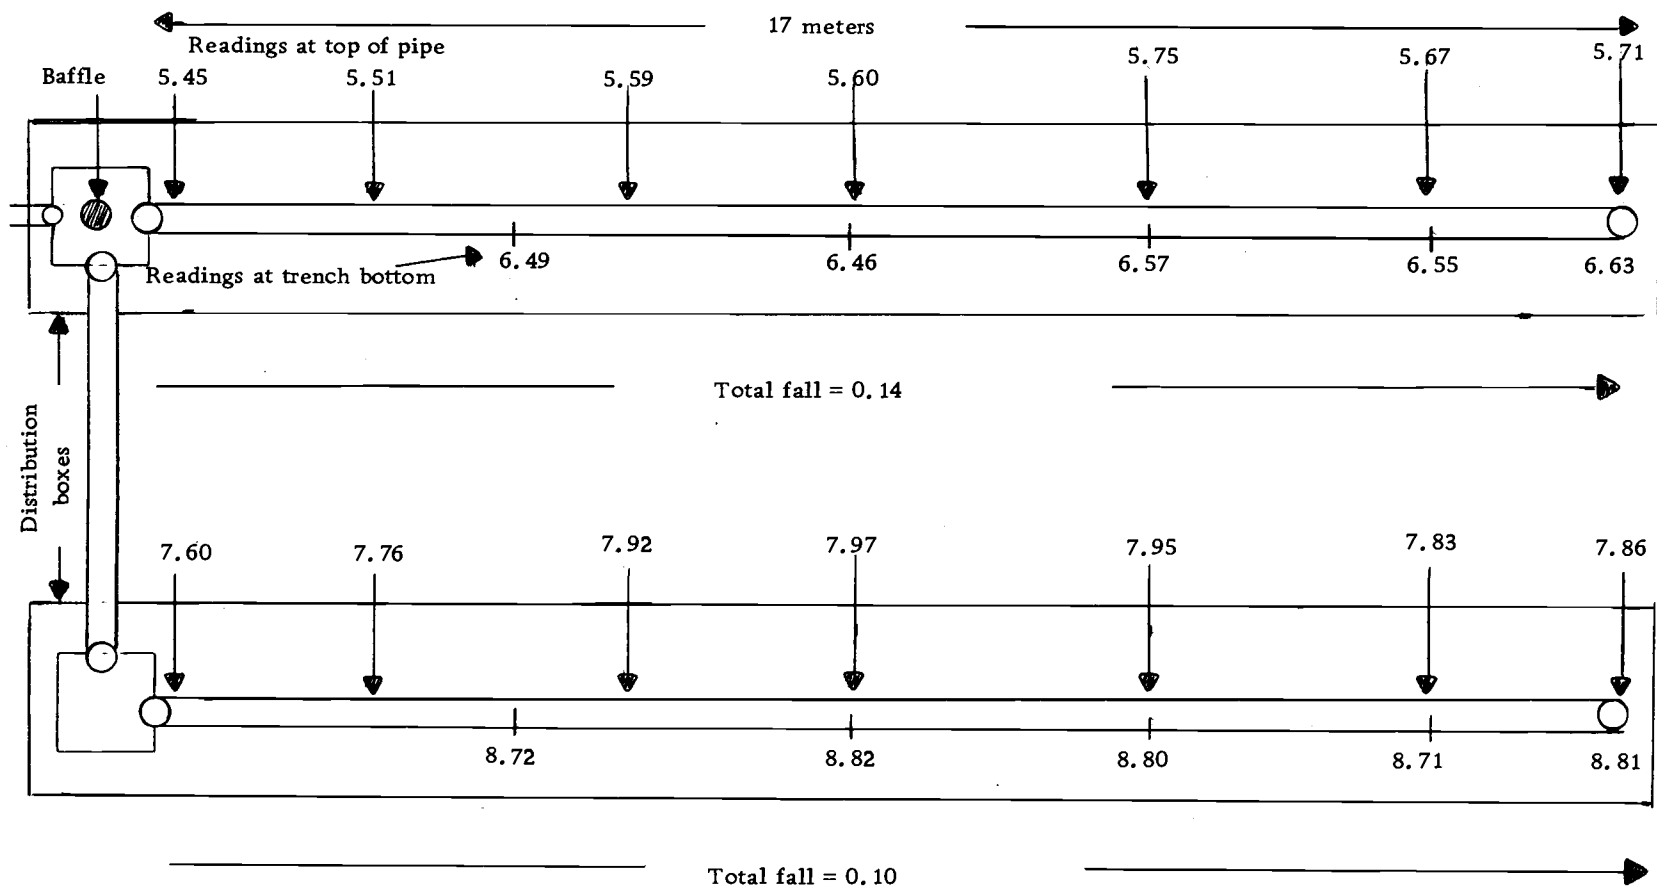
Diagram of drainfield construction - Clarks Branch site.
